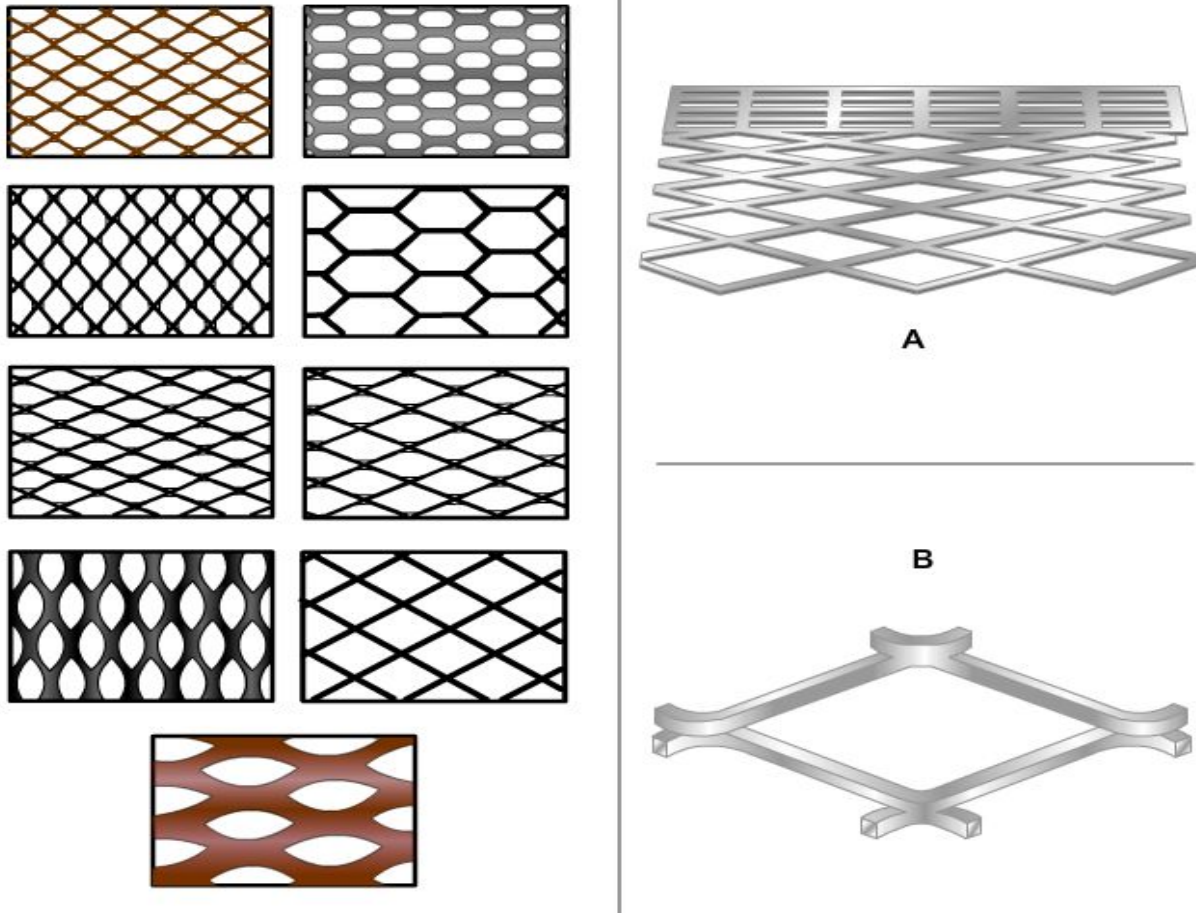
Expanded or diamond mesh steel reinforcement.
